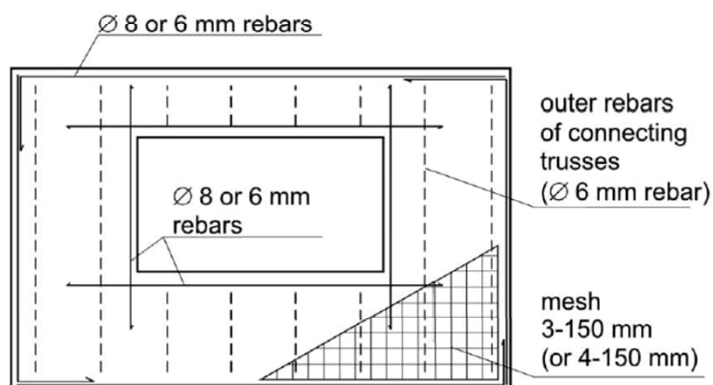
Typical reinforcement of outer layer of a concrete panel (1998).
